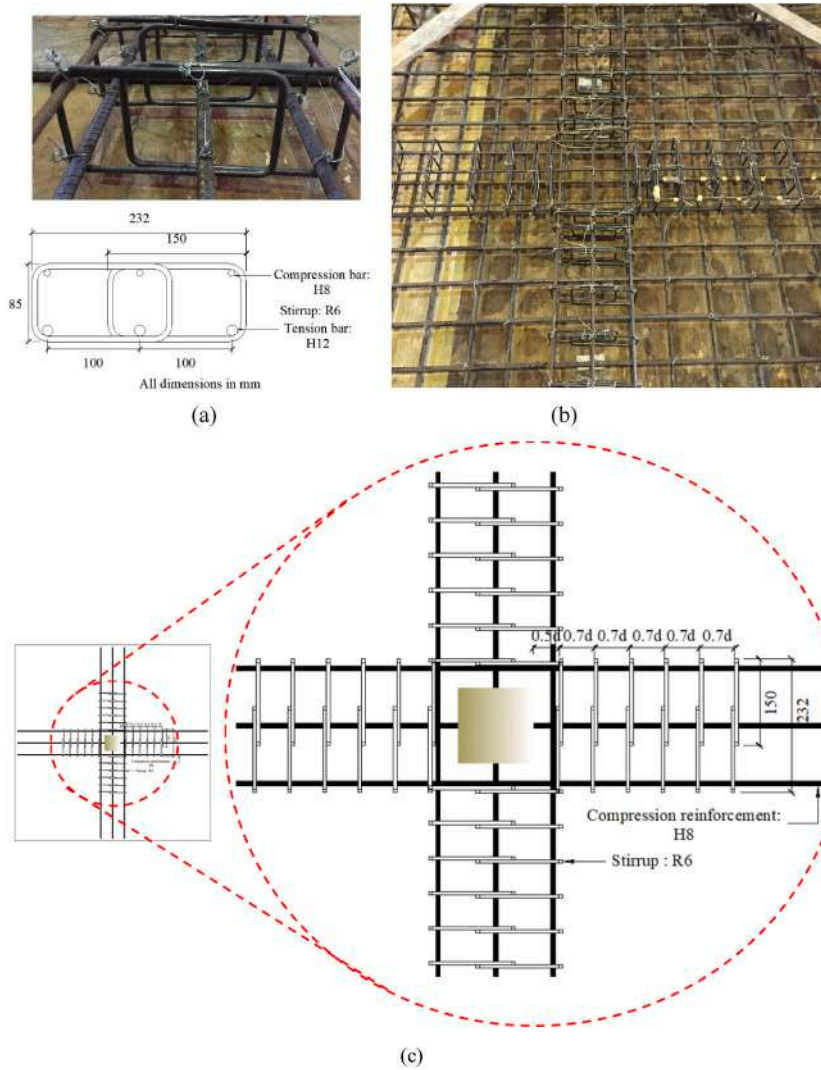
(a) Stirrup reinforcement details and (b) the elevation view of the WIB reinforcement as it was installed in the slab and (c) stirrup reinforcement arrangement plan layout in slab S7.
